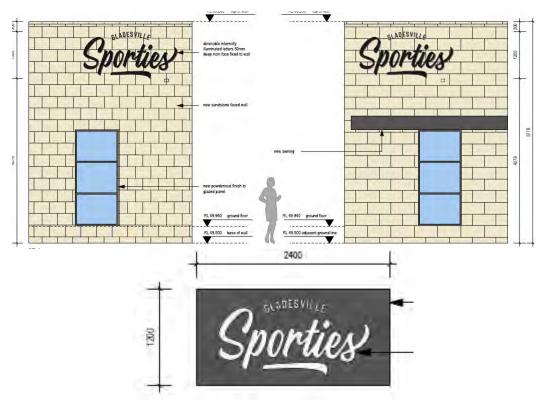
Proposed flush wall signage on Ryde Road frontage
